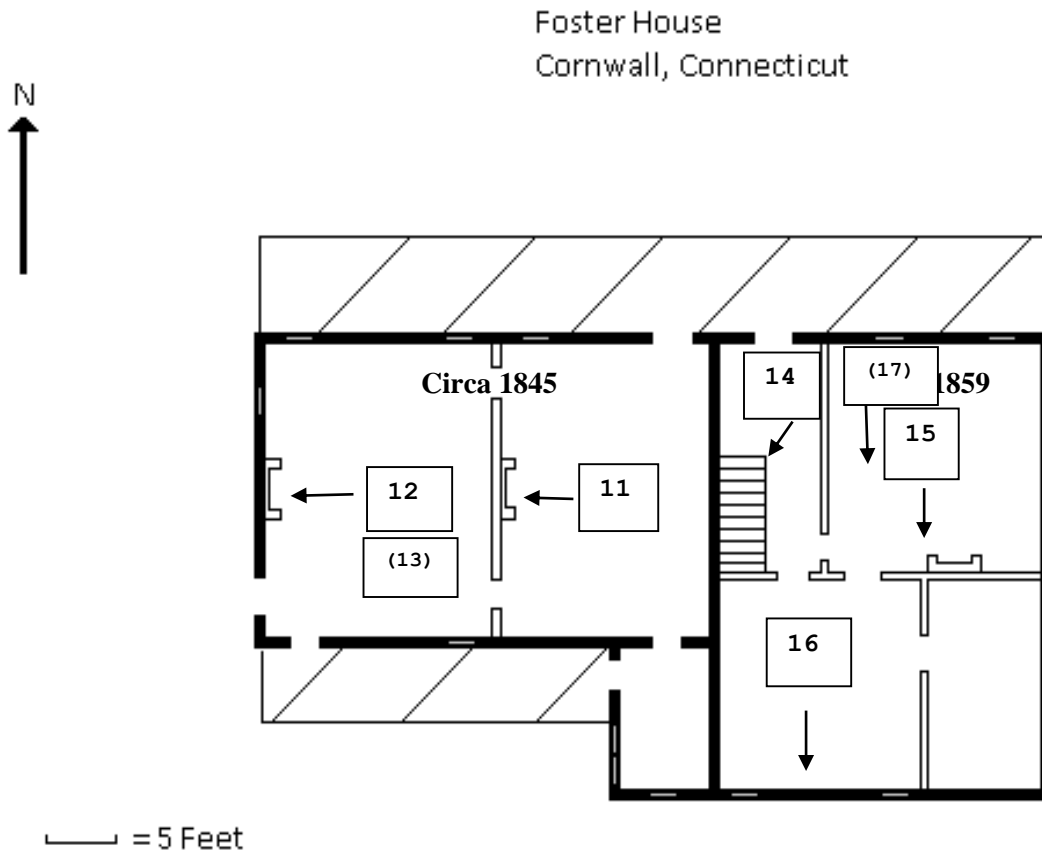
First floor plan of Foster House (façade to top of page; west ell not drawn) with key to interior photos. Note: (13) and (17) in attic.
